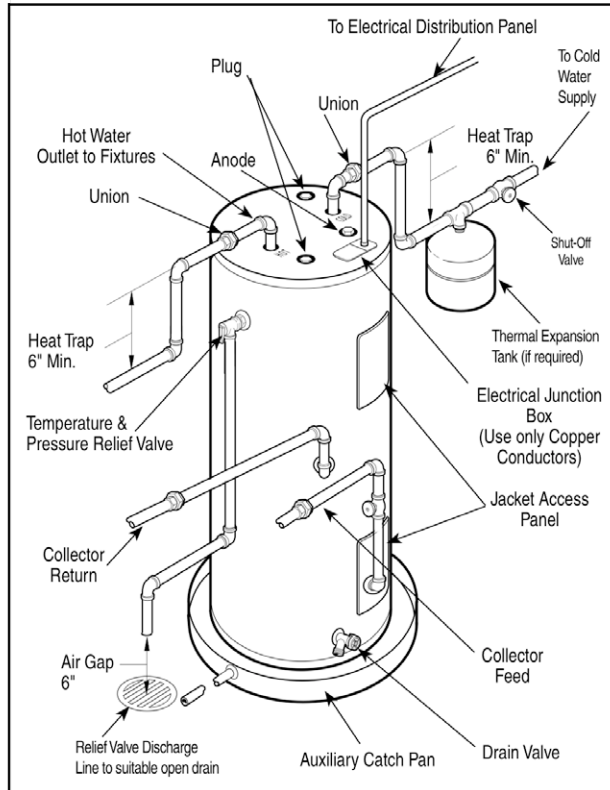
Typical Installation for Side Connections Top collector feed openings must be plugged with 3/4" plugs.
